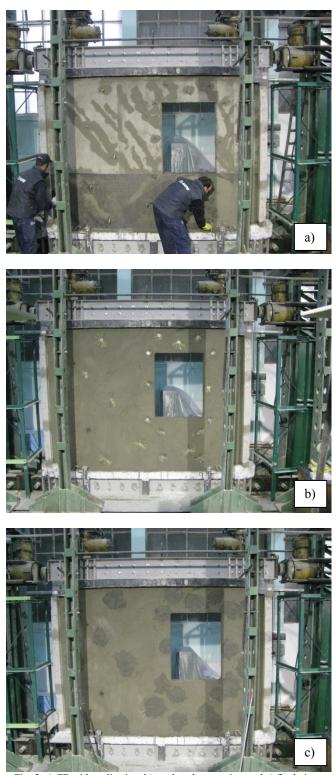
a) CF grid application, b) steel anchorage view and c) final view
